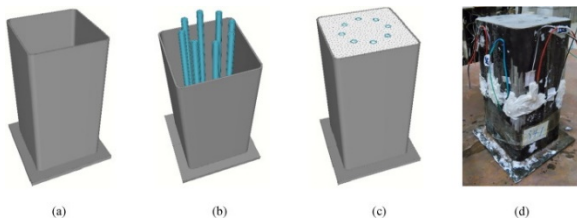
Preparation of square IFT specimens: (a) steel formwork; (b) placement of PVC hoses; (c) schematic of IFT specimen; and (d) IFT specimen.
